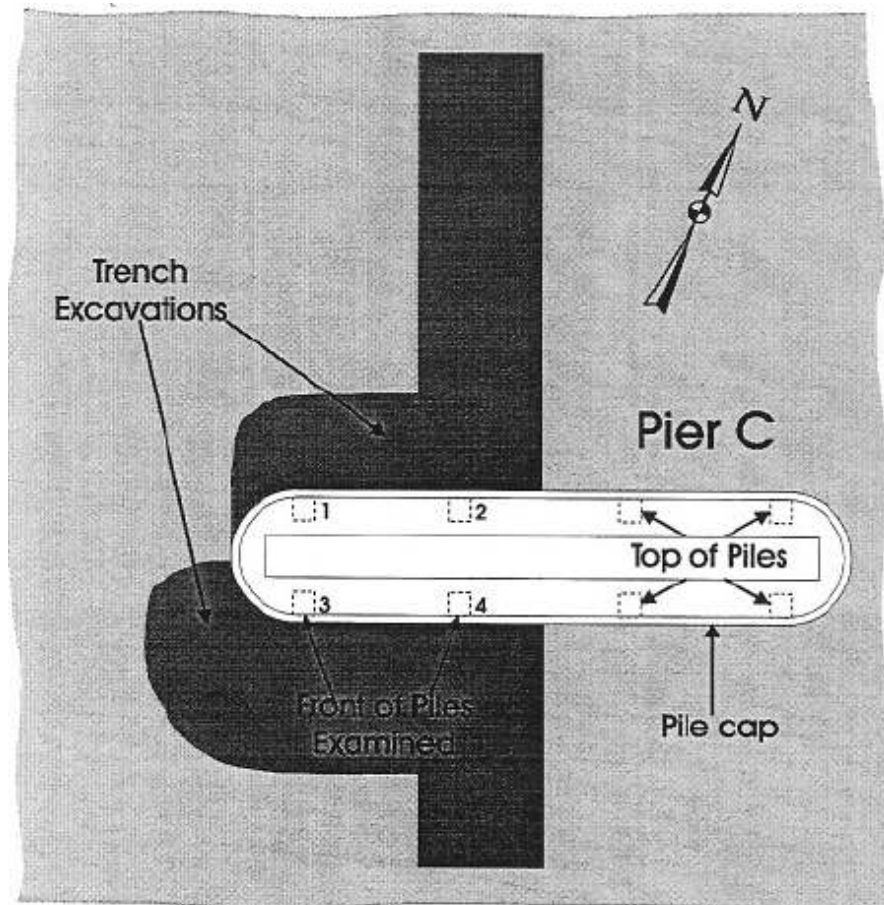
Excavation of Pier C (Keenan, 1996)
